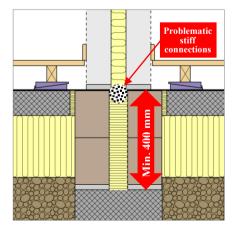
Vertical section showing a foundation/terrain floor assembly.
